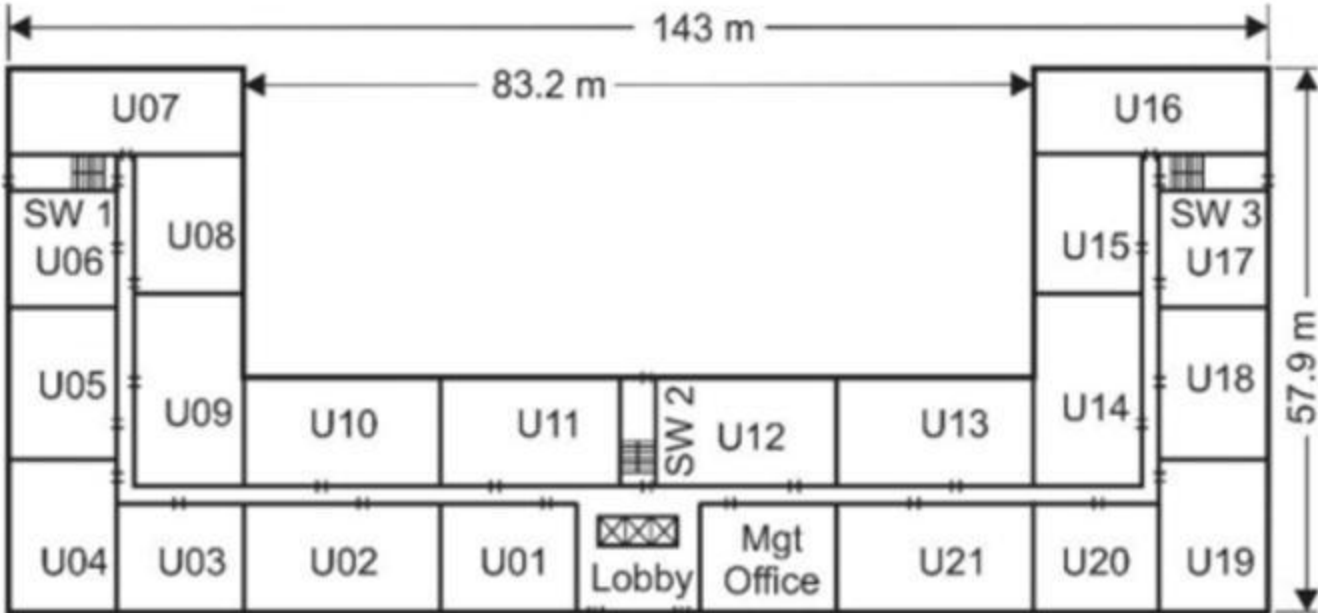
Floor Plans of Example 14-Story Open Plan Office Building
